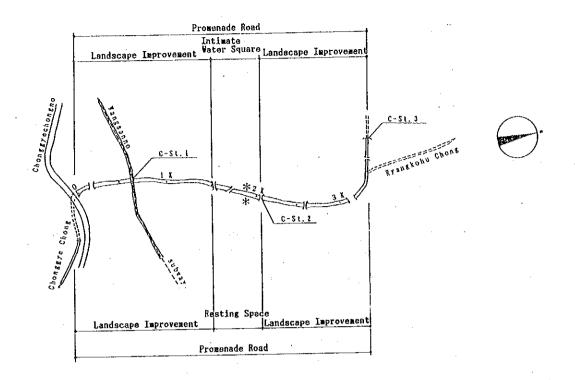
E Proposed Facility Plan of Chungroung Chong
